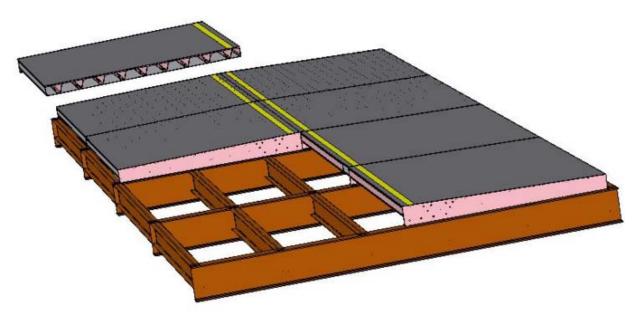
Sandwich Panel Modular Steel Bridge Deck System [58]
